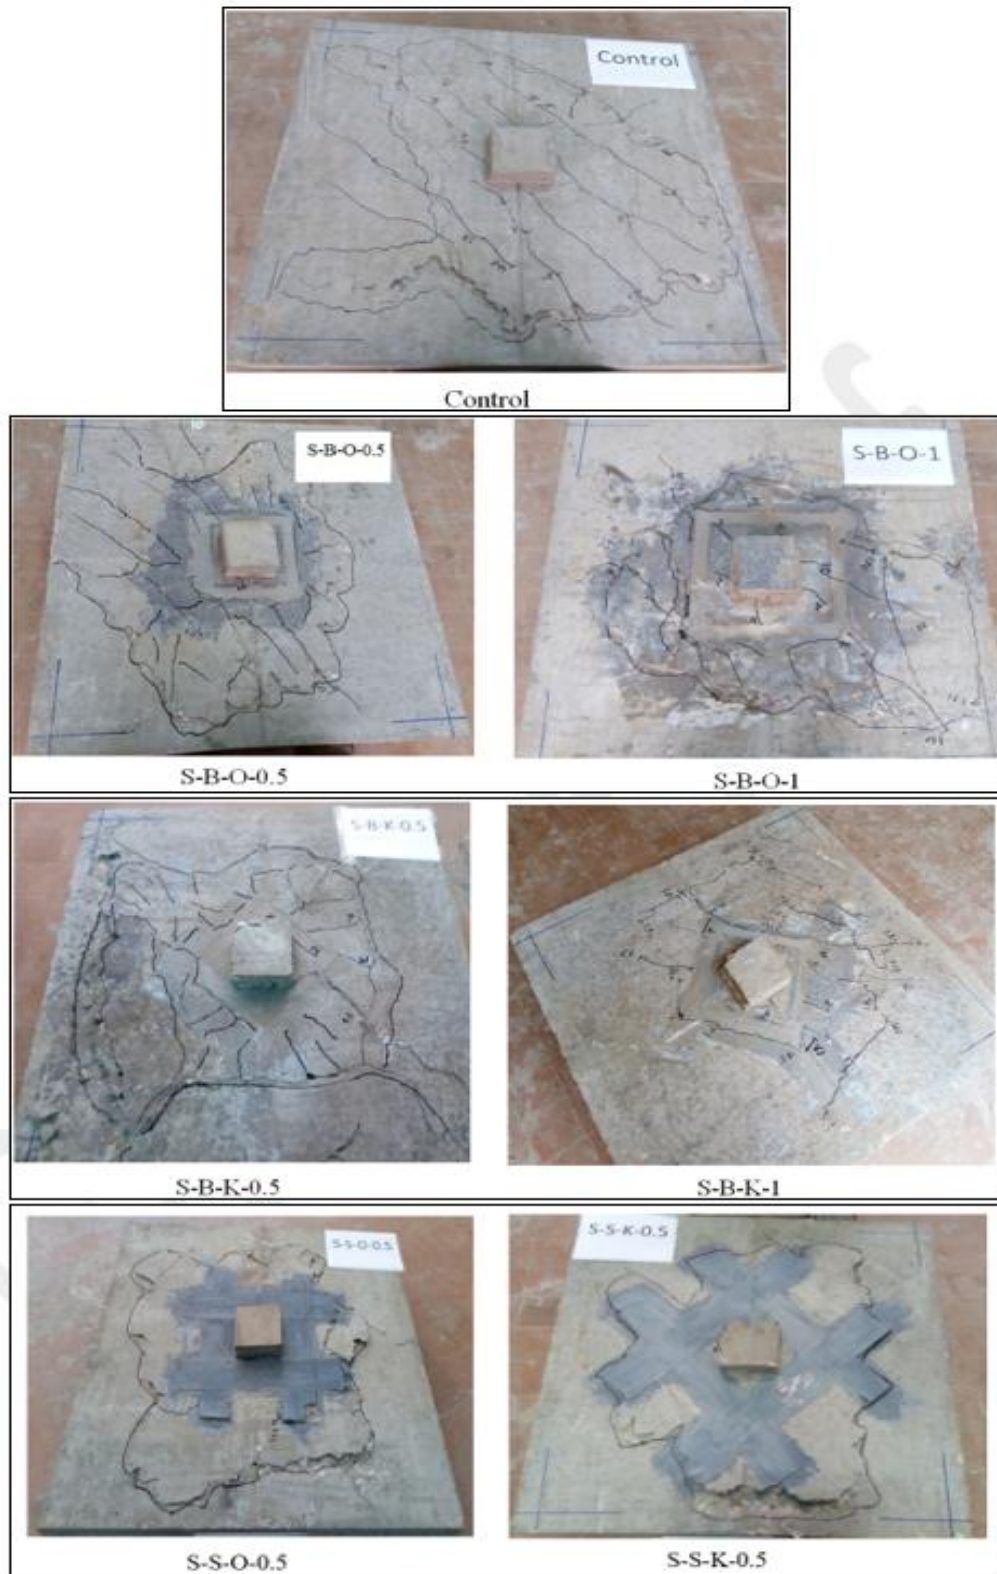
Crack patterns at failure load for the tested specimens (bottom faces)
